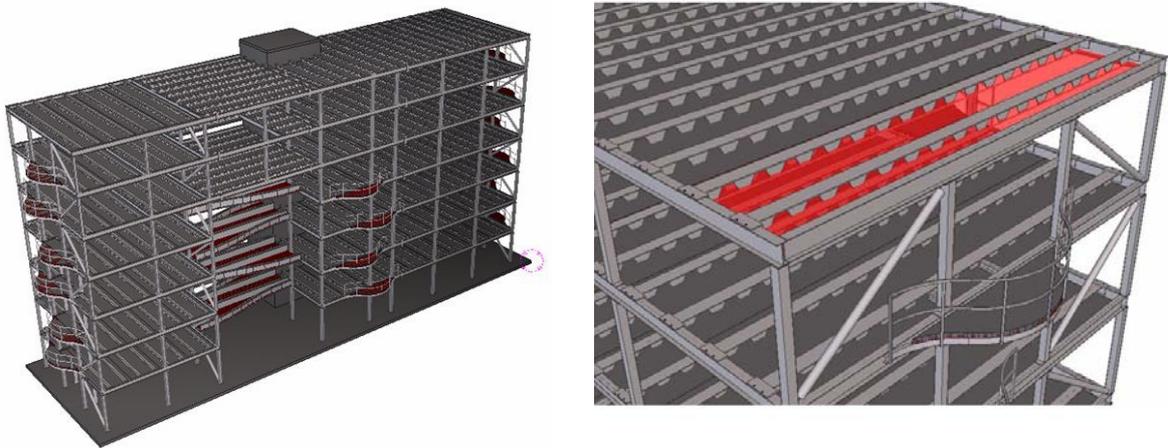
Steel-structure of the planned residential building in Lugano, Switzerland using the novel type of composite slab system
